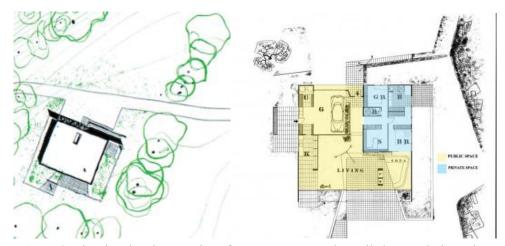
Showing the Site Location of Entenza House and Detailed Ground Floor Plan *Source:* #9's case study.
